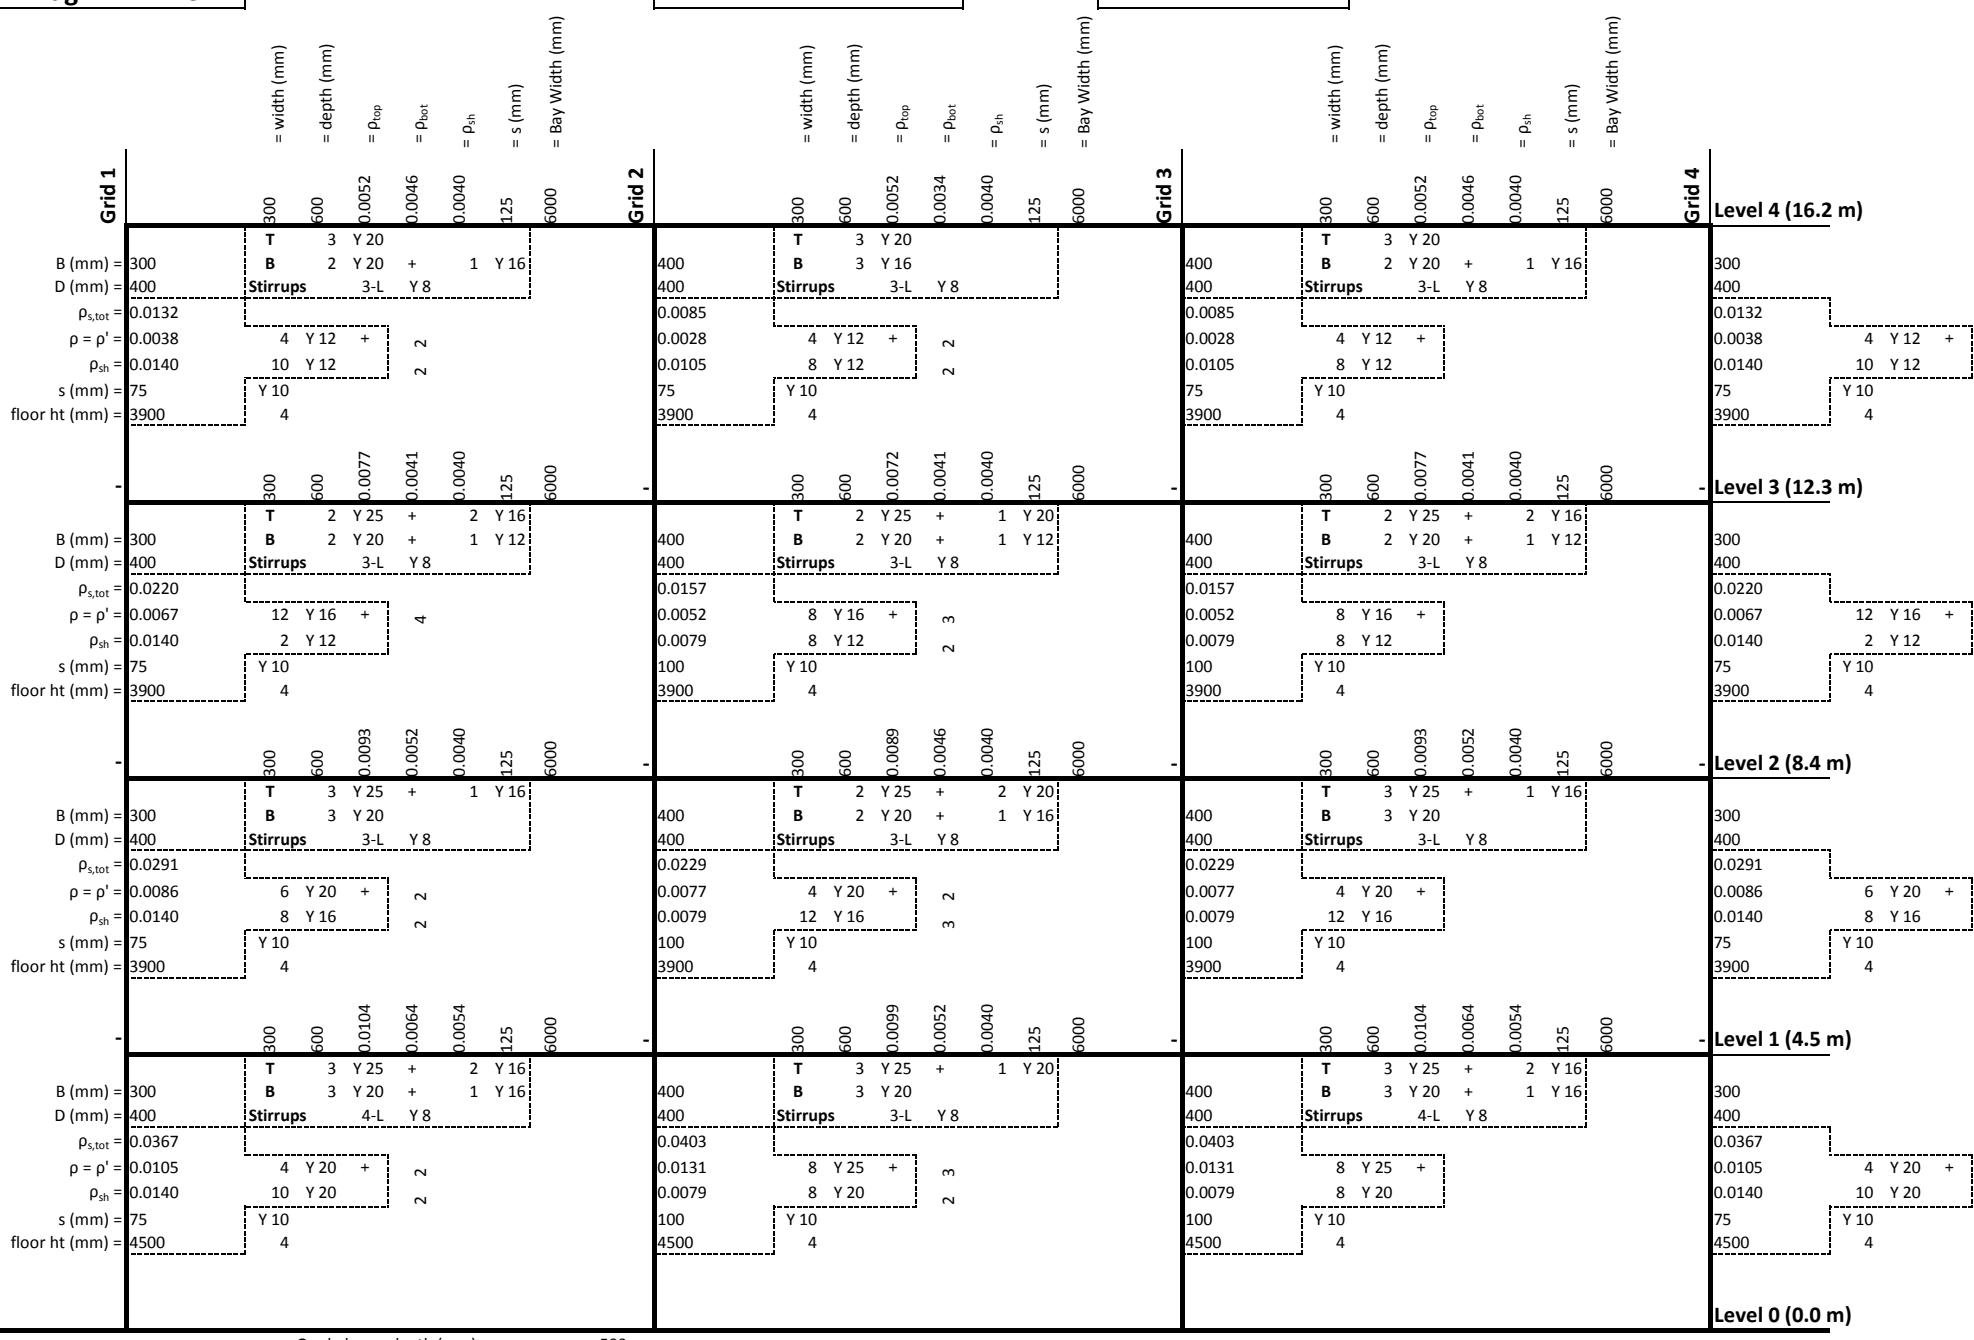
Required transverse reinforcement for building ID 2231
